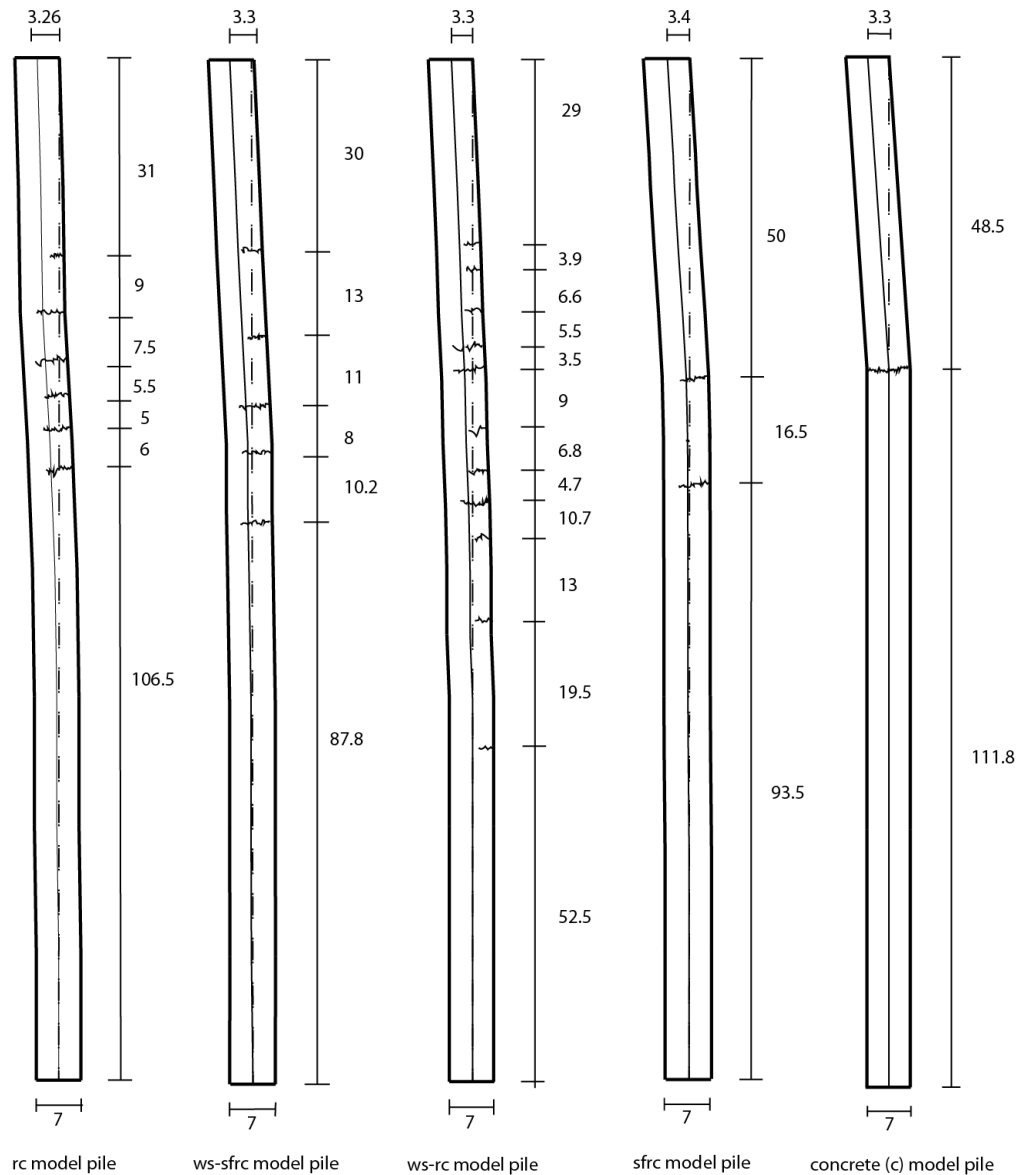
Crack patterns of model piles under lateral loading with 4mm/min rate of loading
